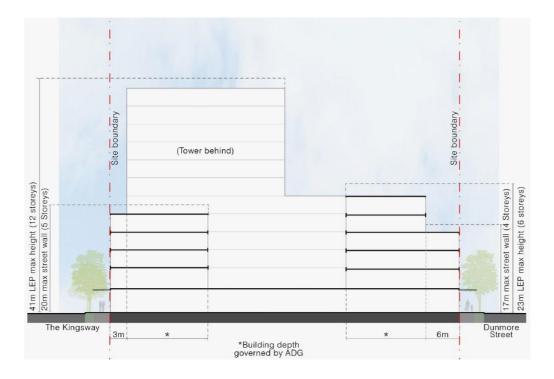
Amalgamated Site 5 - Typical North-South Section
